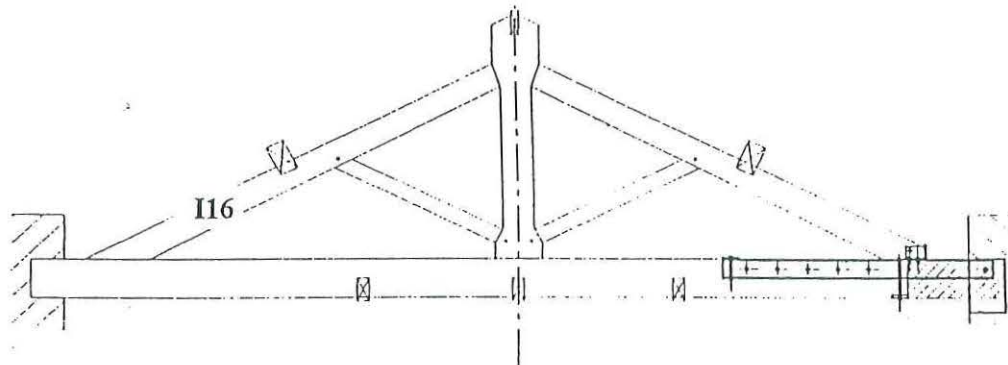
Drawing to show positions of samples from the trusses of the stable roof
